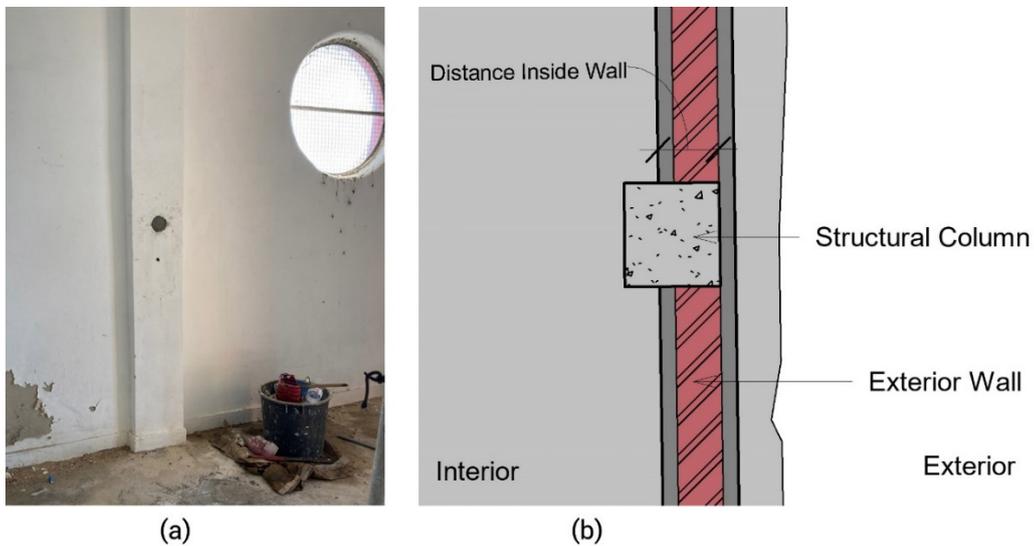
(a) Photo of the column built into the wall. (b) The floor plan showing the embedded column and the distance inside the wall is controlled by the user with defined parameters when using the algorithm.
